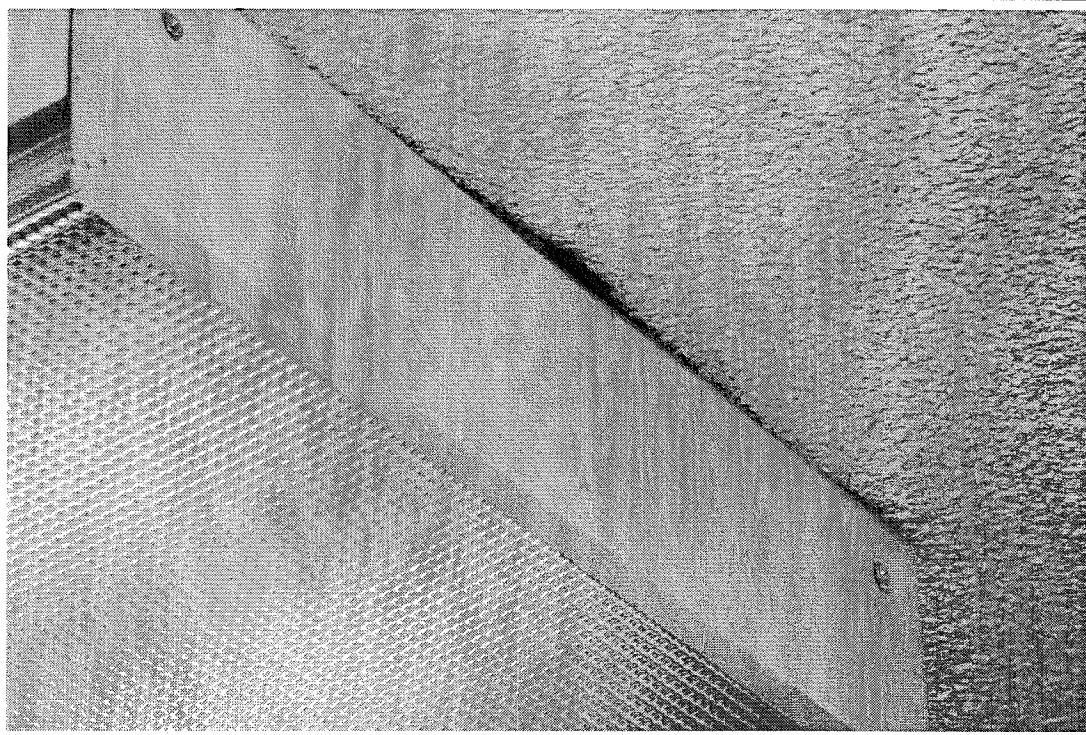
Nursing Administration Bldg., office off east hall - View of damaged acoustical plaster at fluorescent light fixture
